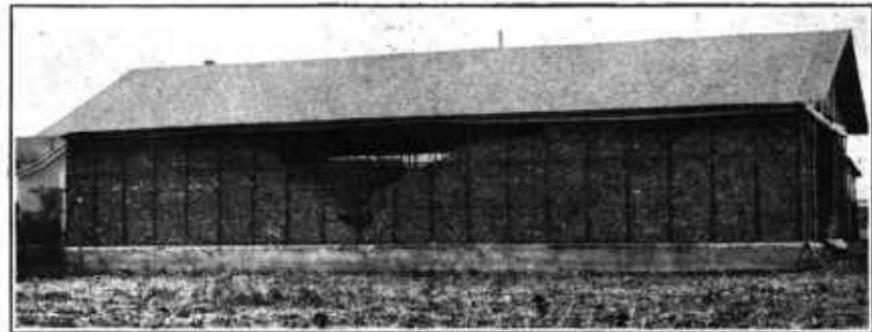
A rat and mouse proof crib having a concrete foundation, an iron frame covered with wire netting, and storm curtains on sides and ends.
